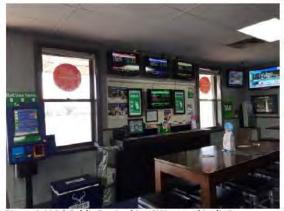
| Public Bar Looking SW toward Inglis St. Windows to be replaced with timber-framed double-hung sashes.
